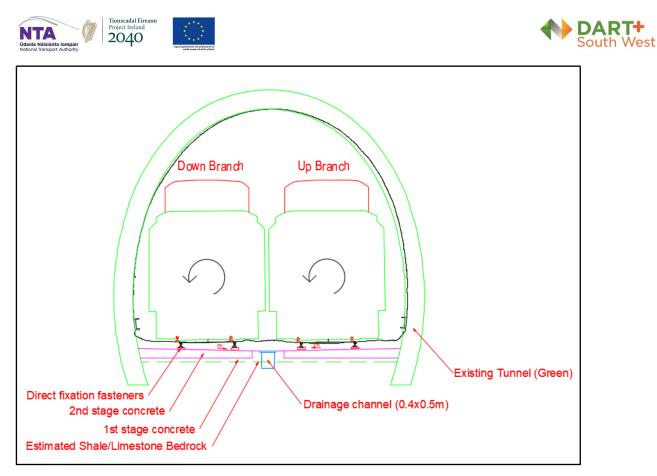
Proposed cross drainage system at Phoenix Park Tunnel
